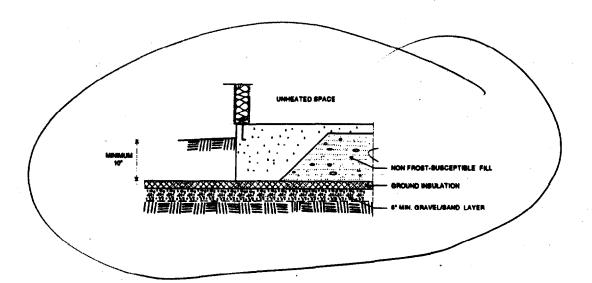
FPSF Design for Unheated Buildings with insulation in Single Plane.
